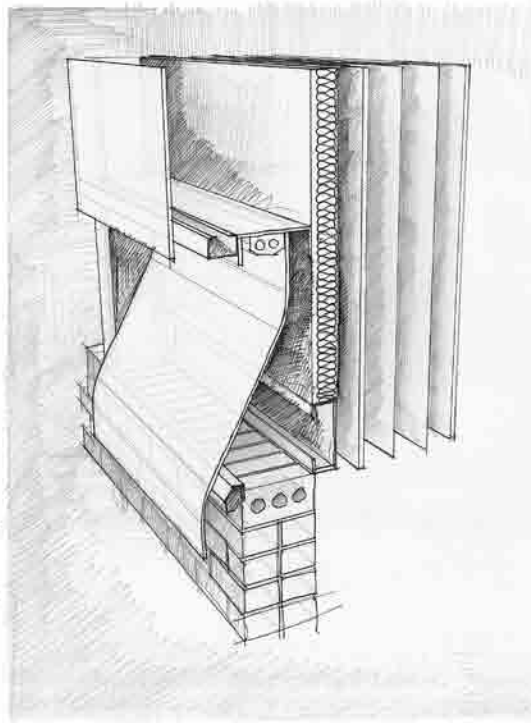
SLIDING WALL DETAIL SCALE: 1:5
